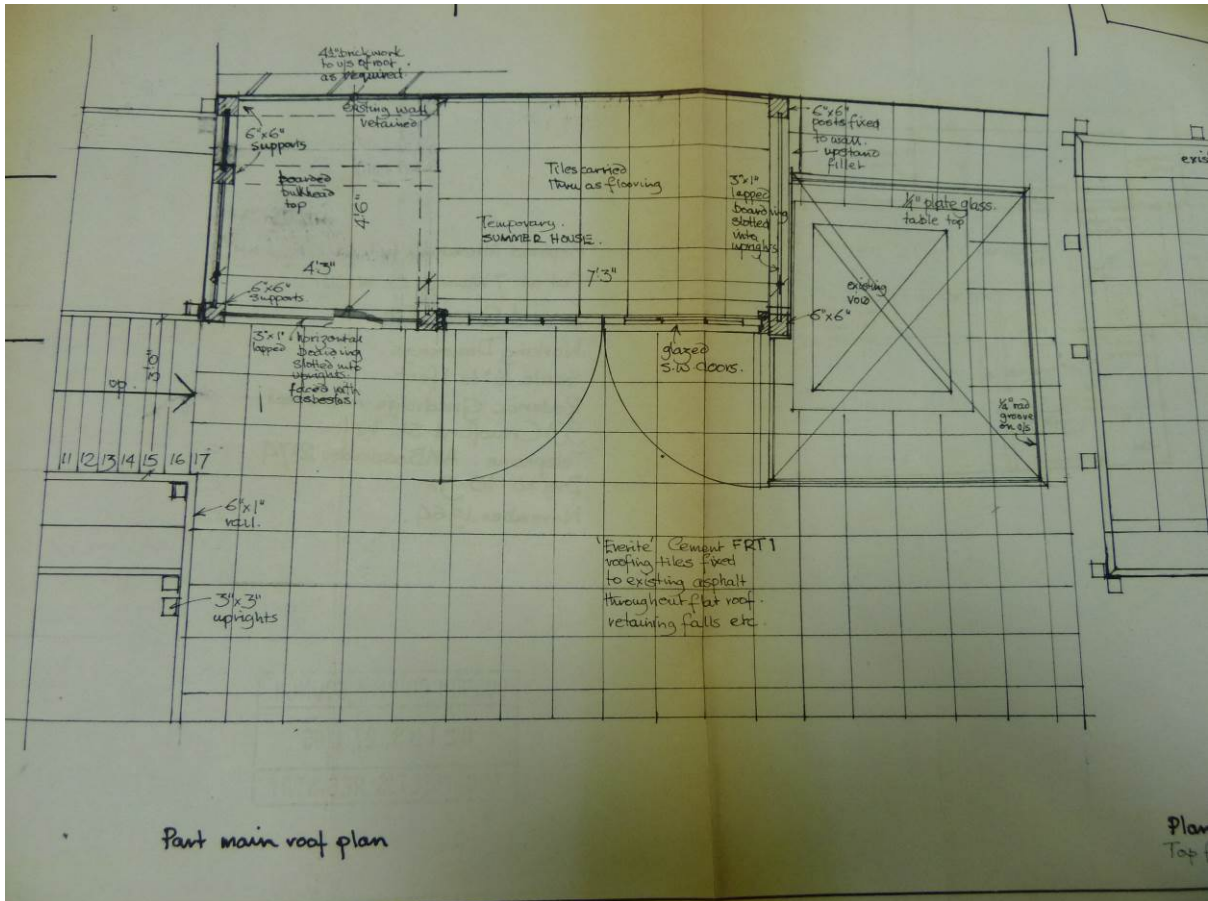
Proposed new roof garden, 1964, Roderick Gradidge (LB Camden, planning file)
